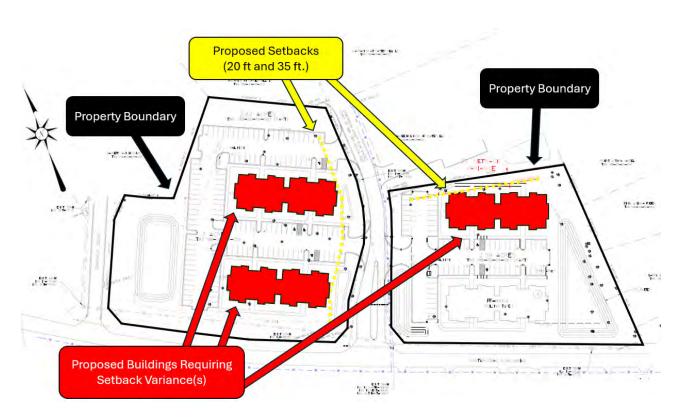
Plan View of Proposed Structure Placement and Property Boundaries
